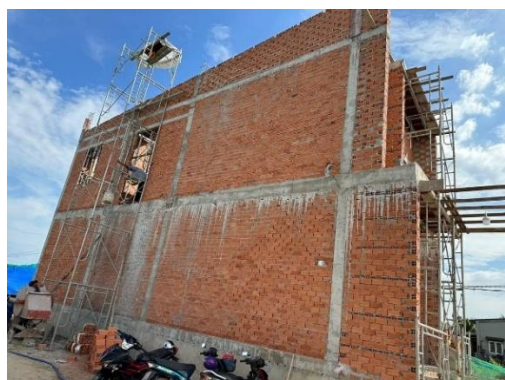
The low-rise building is constructed with a reinforced concrete structure and fired clay brick walls in Ho Chi Minh City
